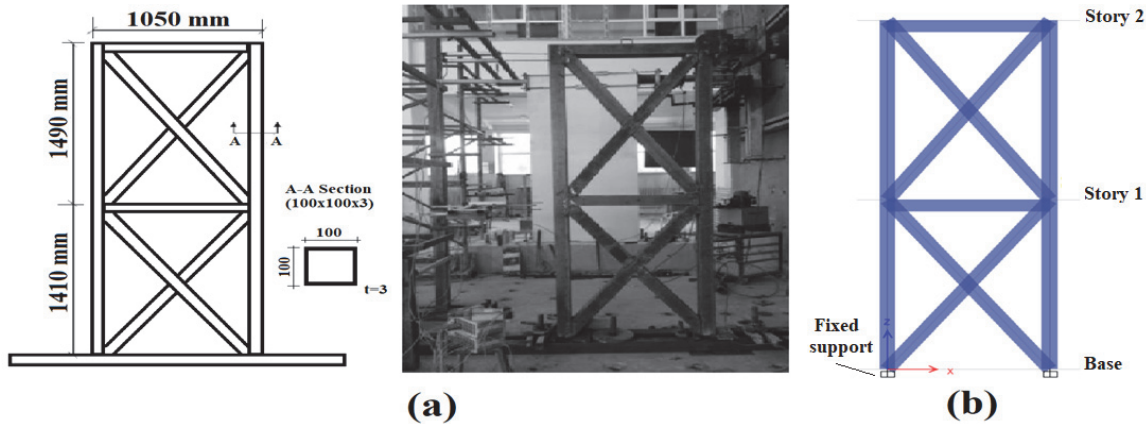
Details of steel frame specimen (a) experimental [49] and (b) ETABS.
